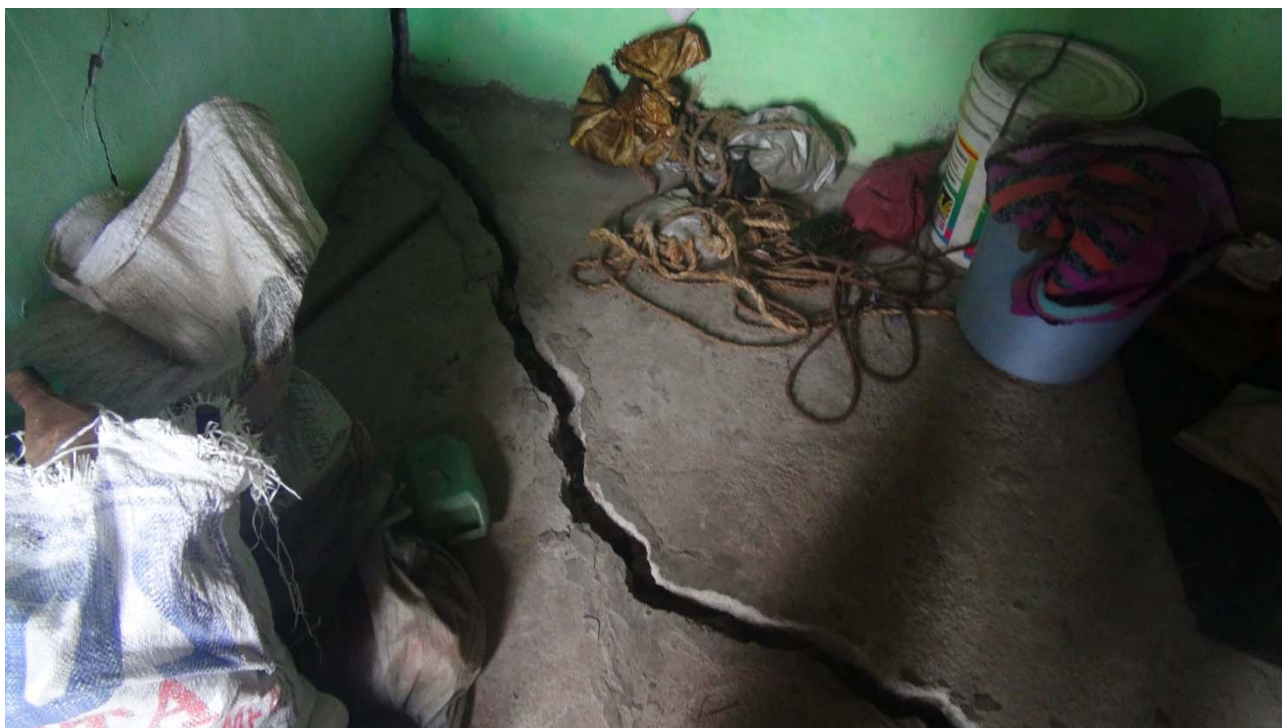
Large crack in the floor of a cement house in Lalita's natal village
